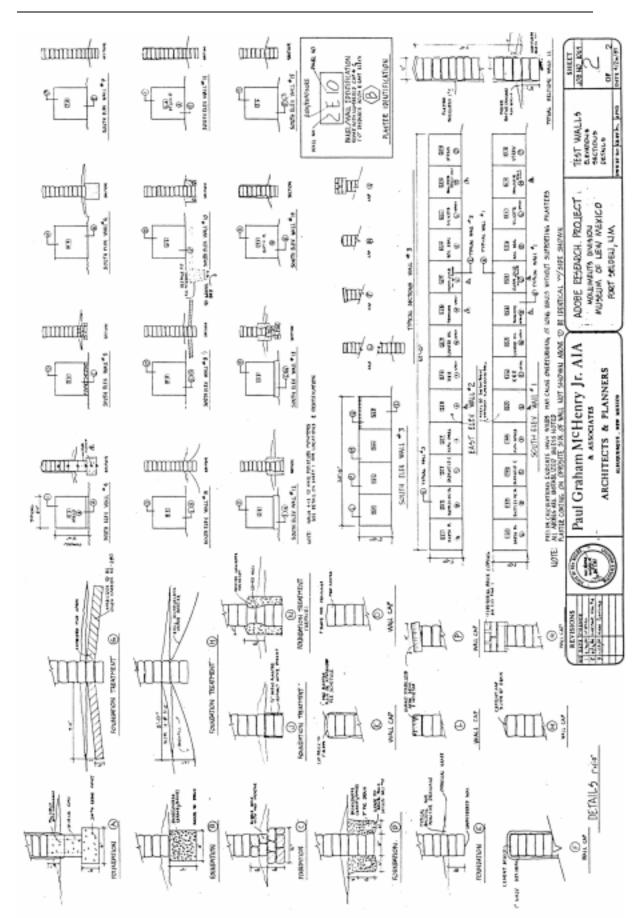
Elevations, sections, and details of test walls constructed for the Fort SeldenAdobe Test Wall Project – Phase I.
